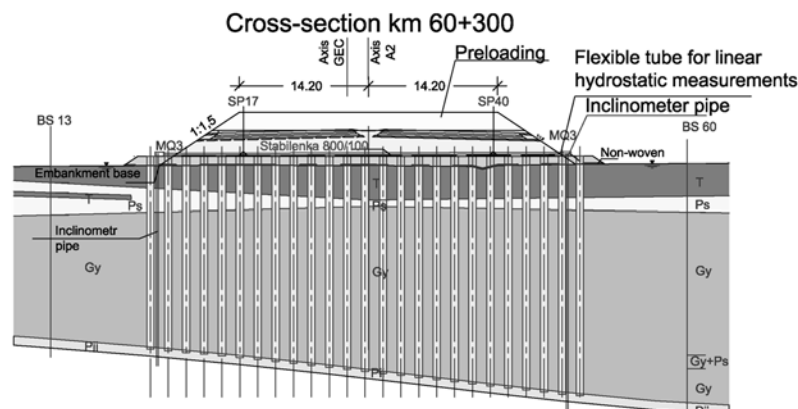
GEC-cross-section, embankment with preloading, km 60+300
